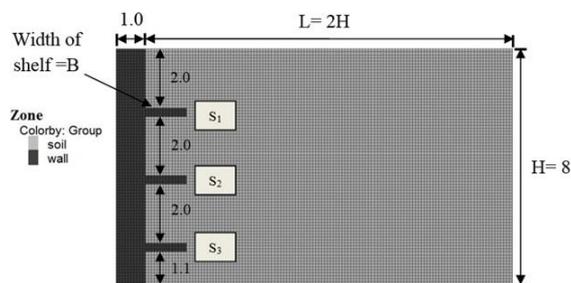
Numerical model of rigid retaining wall with relief shelves, all dimensions in m (not to scale)
